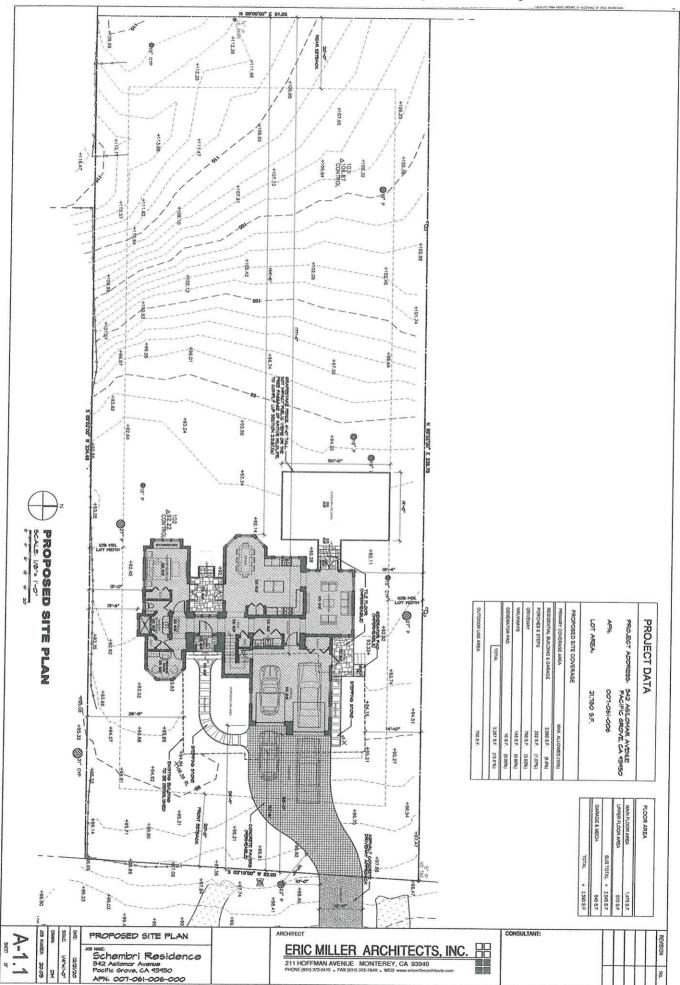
PROPOSED SITE PLAN (12/22/20)
